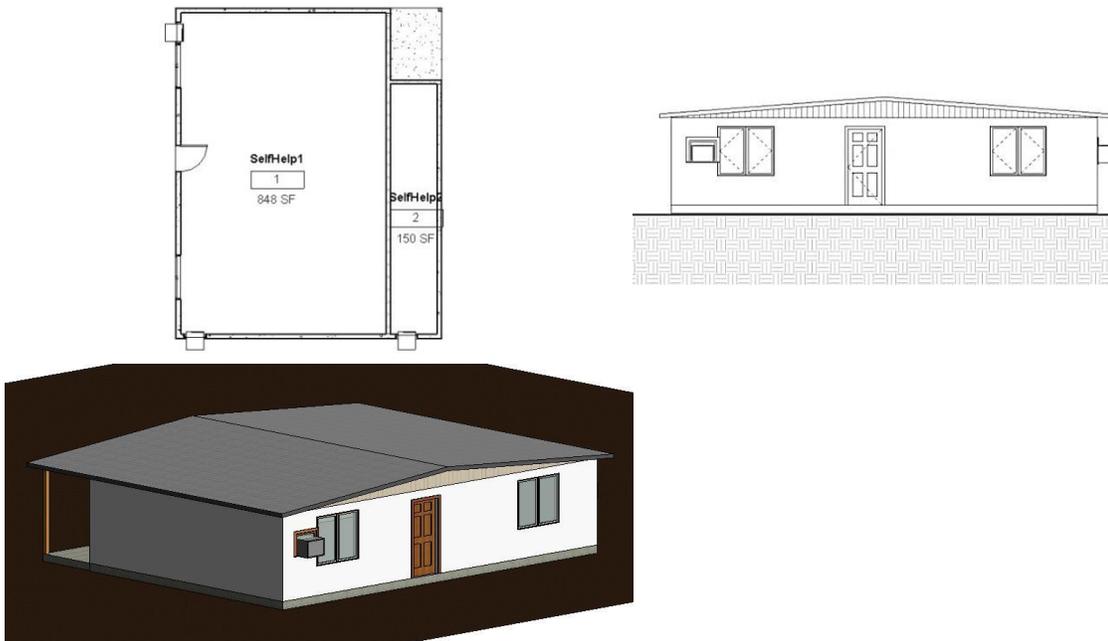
House 30 a concrete self-built structure: Plan, West elevation, and 3D BIM model.
